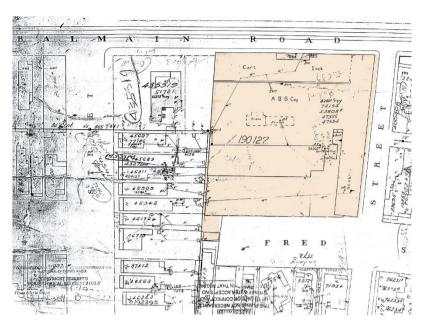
Drainage plan showing an outline of the buildings on the site. Source: Sydney Water.
